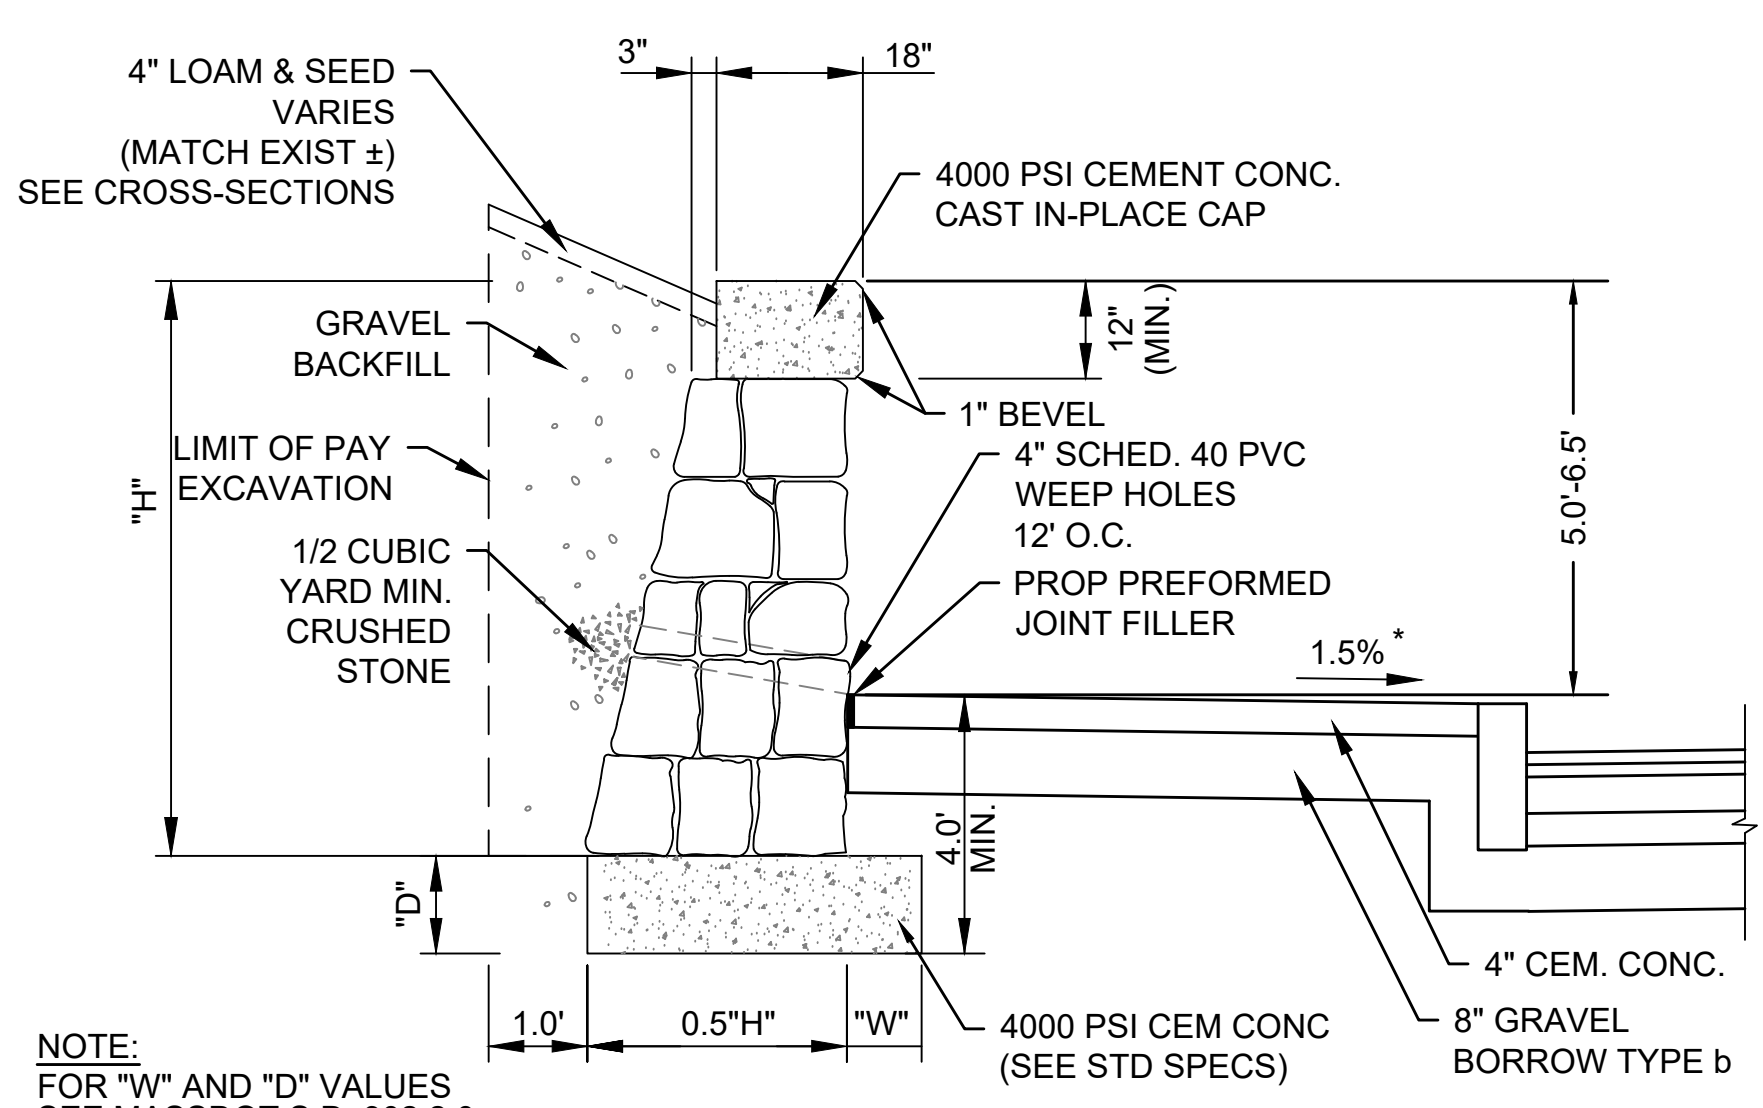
DETAIL FOR BOX WIDENING GREATER THAN 4.0'
